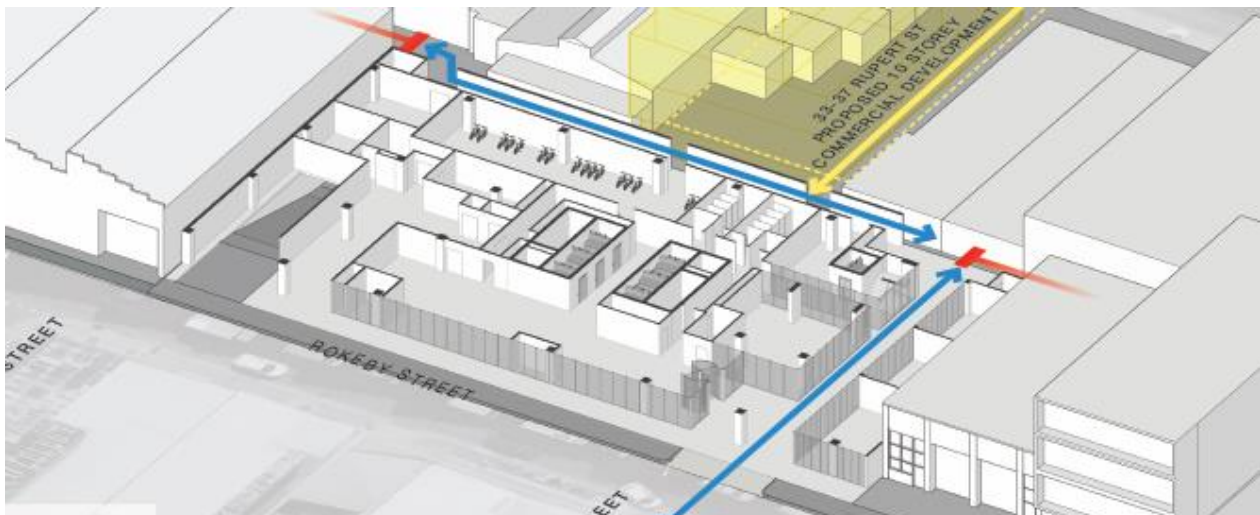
Ground floor plans with publically accessible path of travel delineated in blue at No 40-50 Rokeby Street and yellow at 33-37 Rupert Street (subject site).
